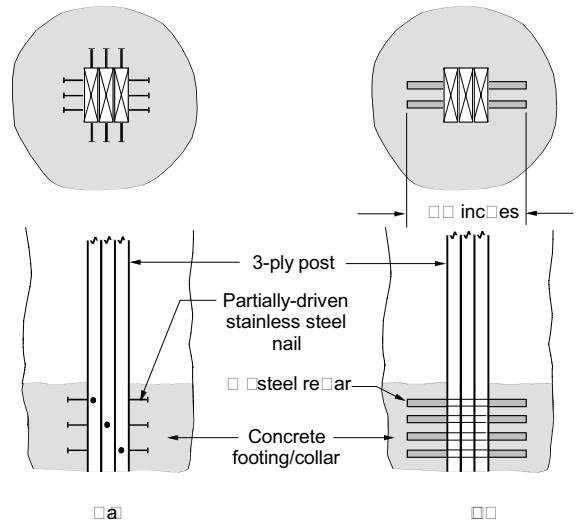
Post foundations with poured-in-place concrete footing/collar. Post bears directly on soil. Load transferred to footing/collar via (a) stainless steel nails, and (b) steel rebar.
